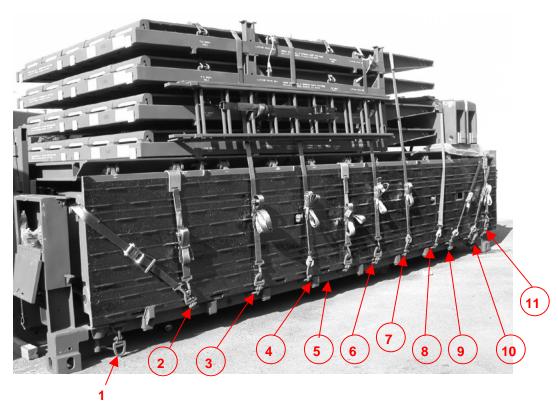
103 T1 - Ramp, Approach Ramps, Access Ladders and End Beams
